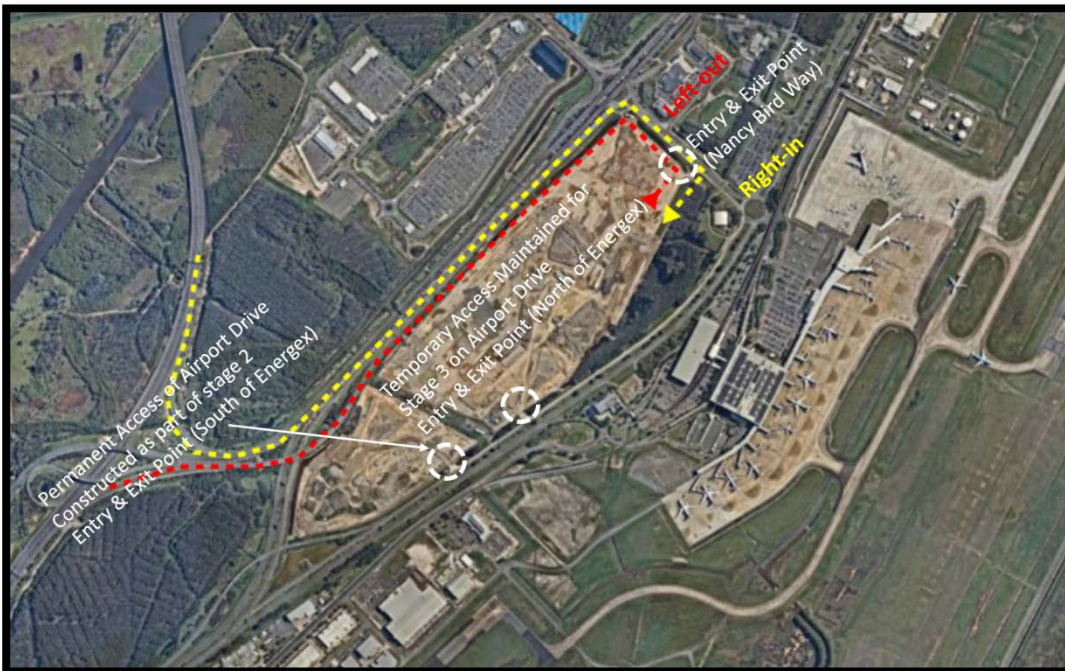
Construction routes from west accessing the site from Nancy Bird Way
